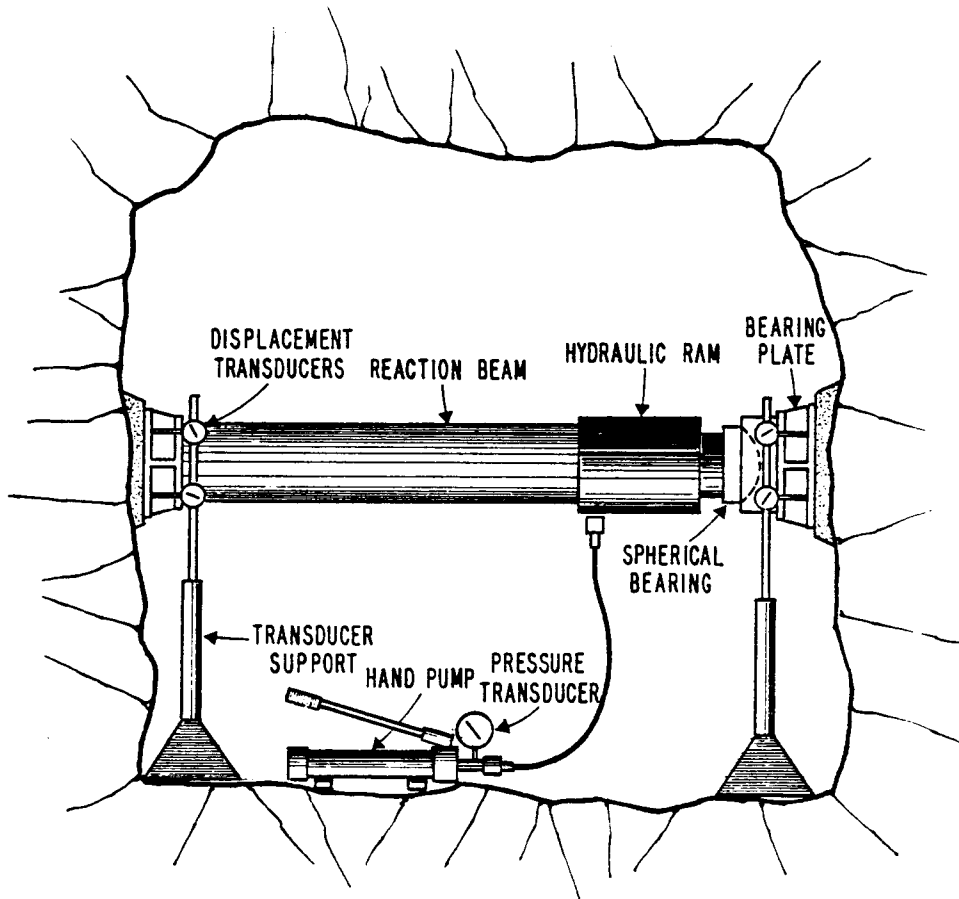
TYPICAL RIGID PLATE BEARING TEST SETUP SCHEMATIC
